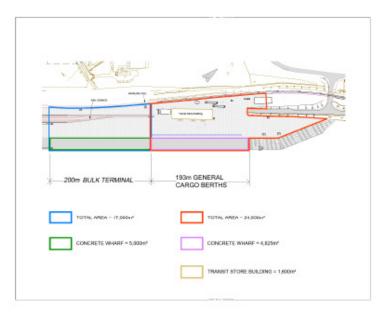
Layout of existing Bulk and General Cargo Berths
